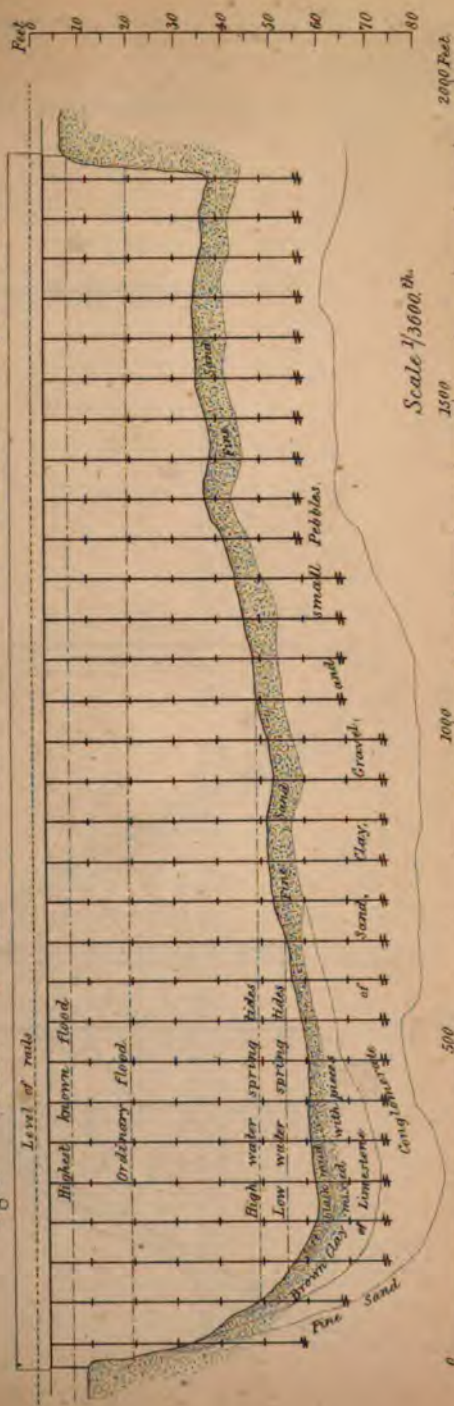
General Elevation of Taptee Bridge, 1891 feet long.
